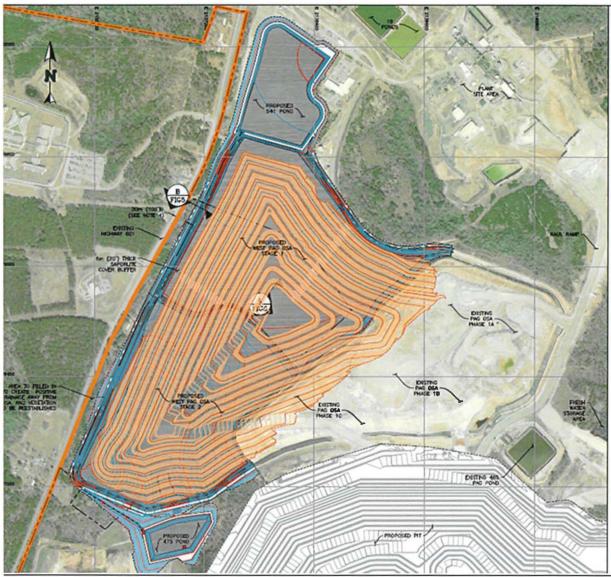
West PAG Plan View with 541 Pond (north) and 475 Pond (south)
